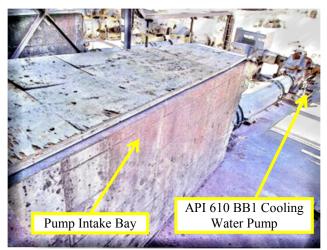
Existing Cooling Water Sump Intake System (Pump Bay and API 610 BB1 Cooling Water Pump)
